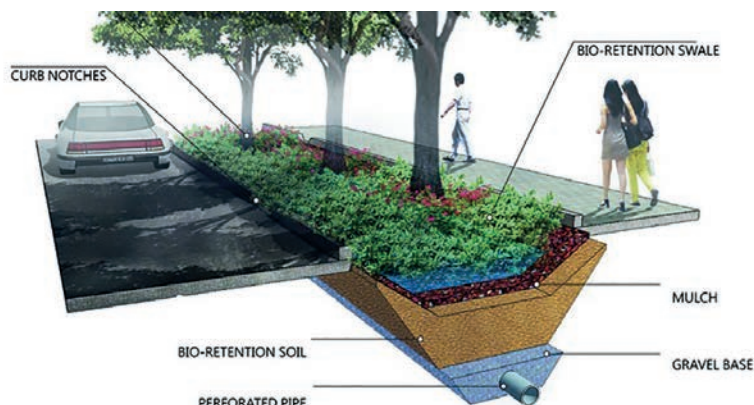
Integrated drainage and landscape design in accordance to developed section.
